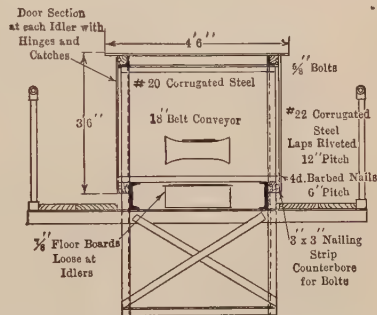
Steel Bridge and Enclosure for Belt Conveyor. Housing Open on the Bottom.
